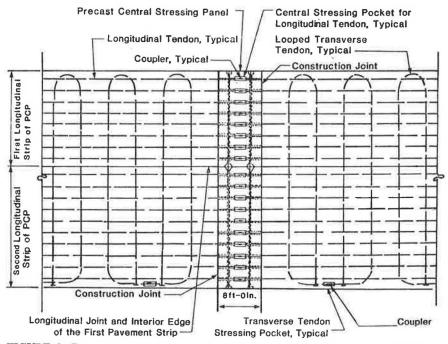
Precast joint panels, central stressing panels, and slip-formed pavement.
